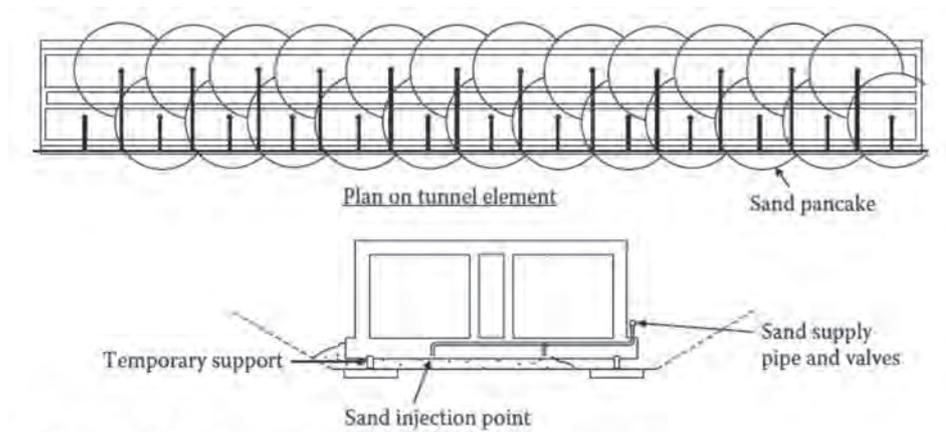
Sand flow arrangement (ref : Immersed Tunnels, Lunniss/Baber).
